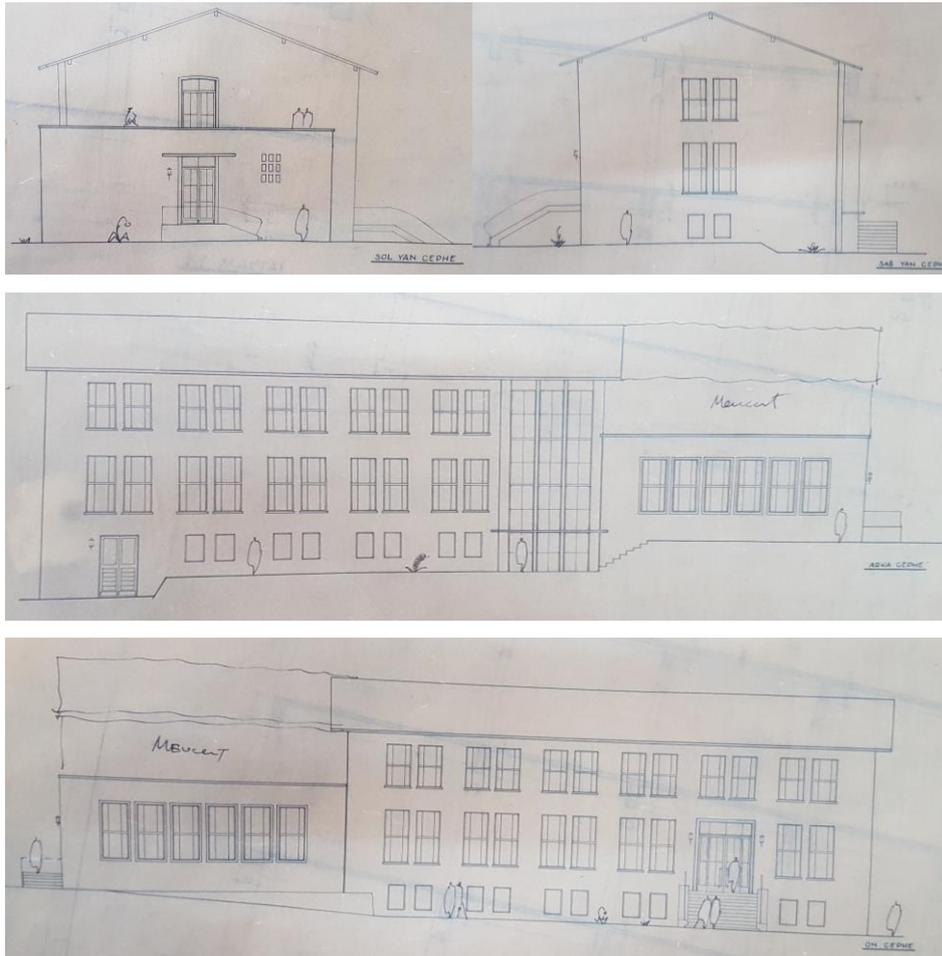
The elevation drawings of the hospital (Source: TTK Archive, 2020)
